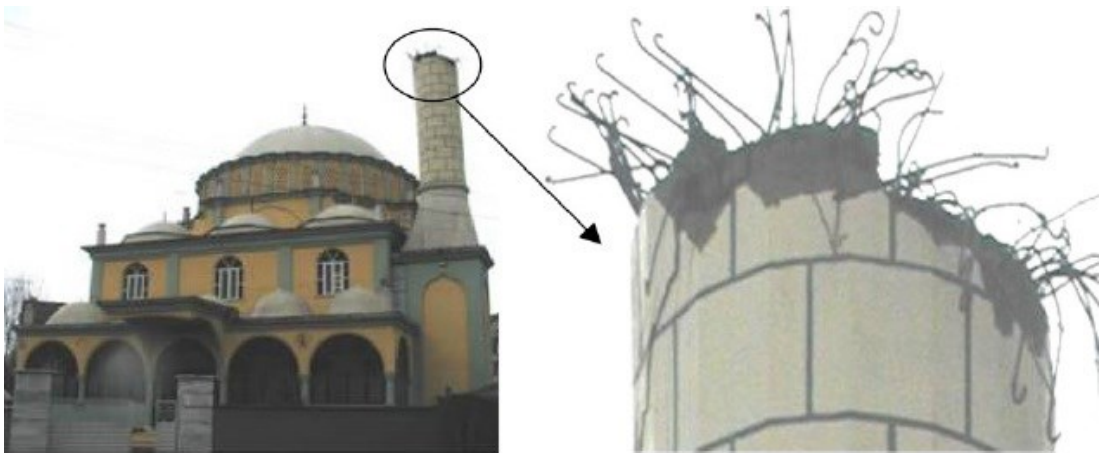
Splicing of transverse reinforcement and longitudinal bars with 180end hooks.
